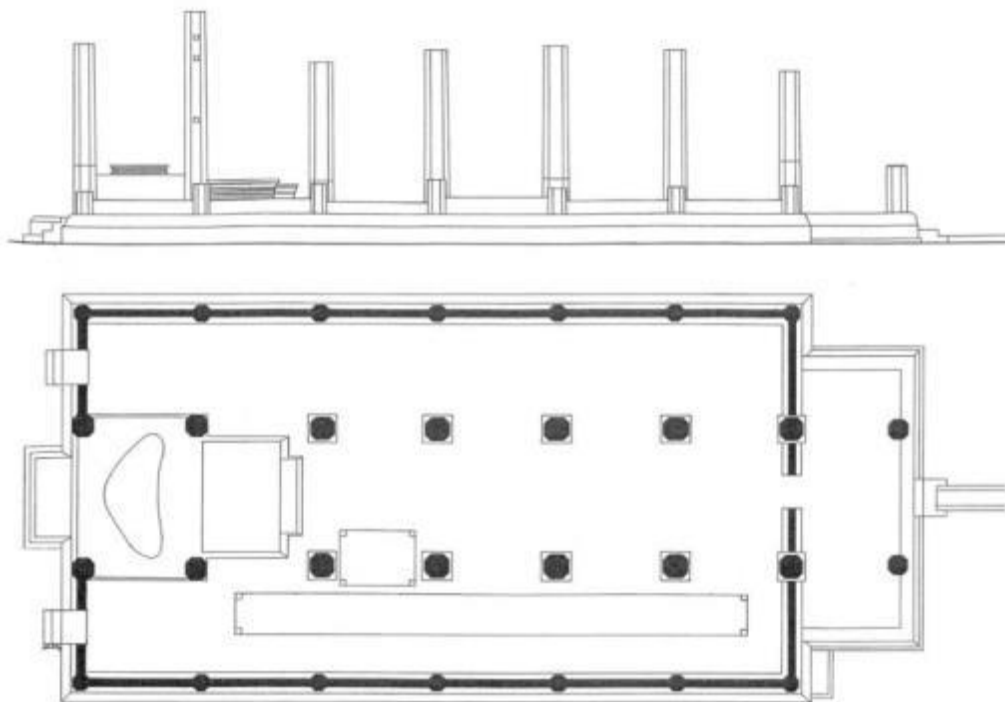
Lay-out plan and elevation of Vihara, Wat Chang Lom.
